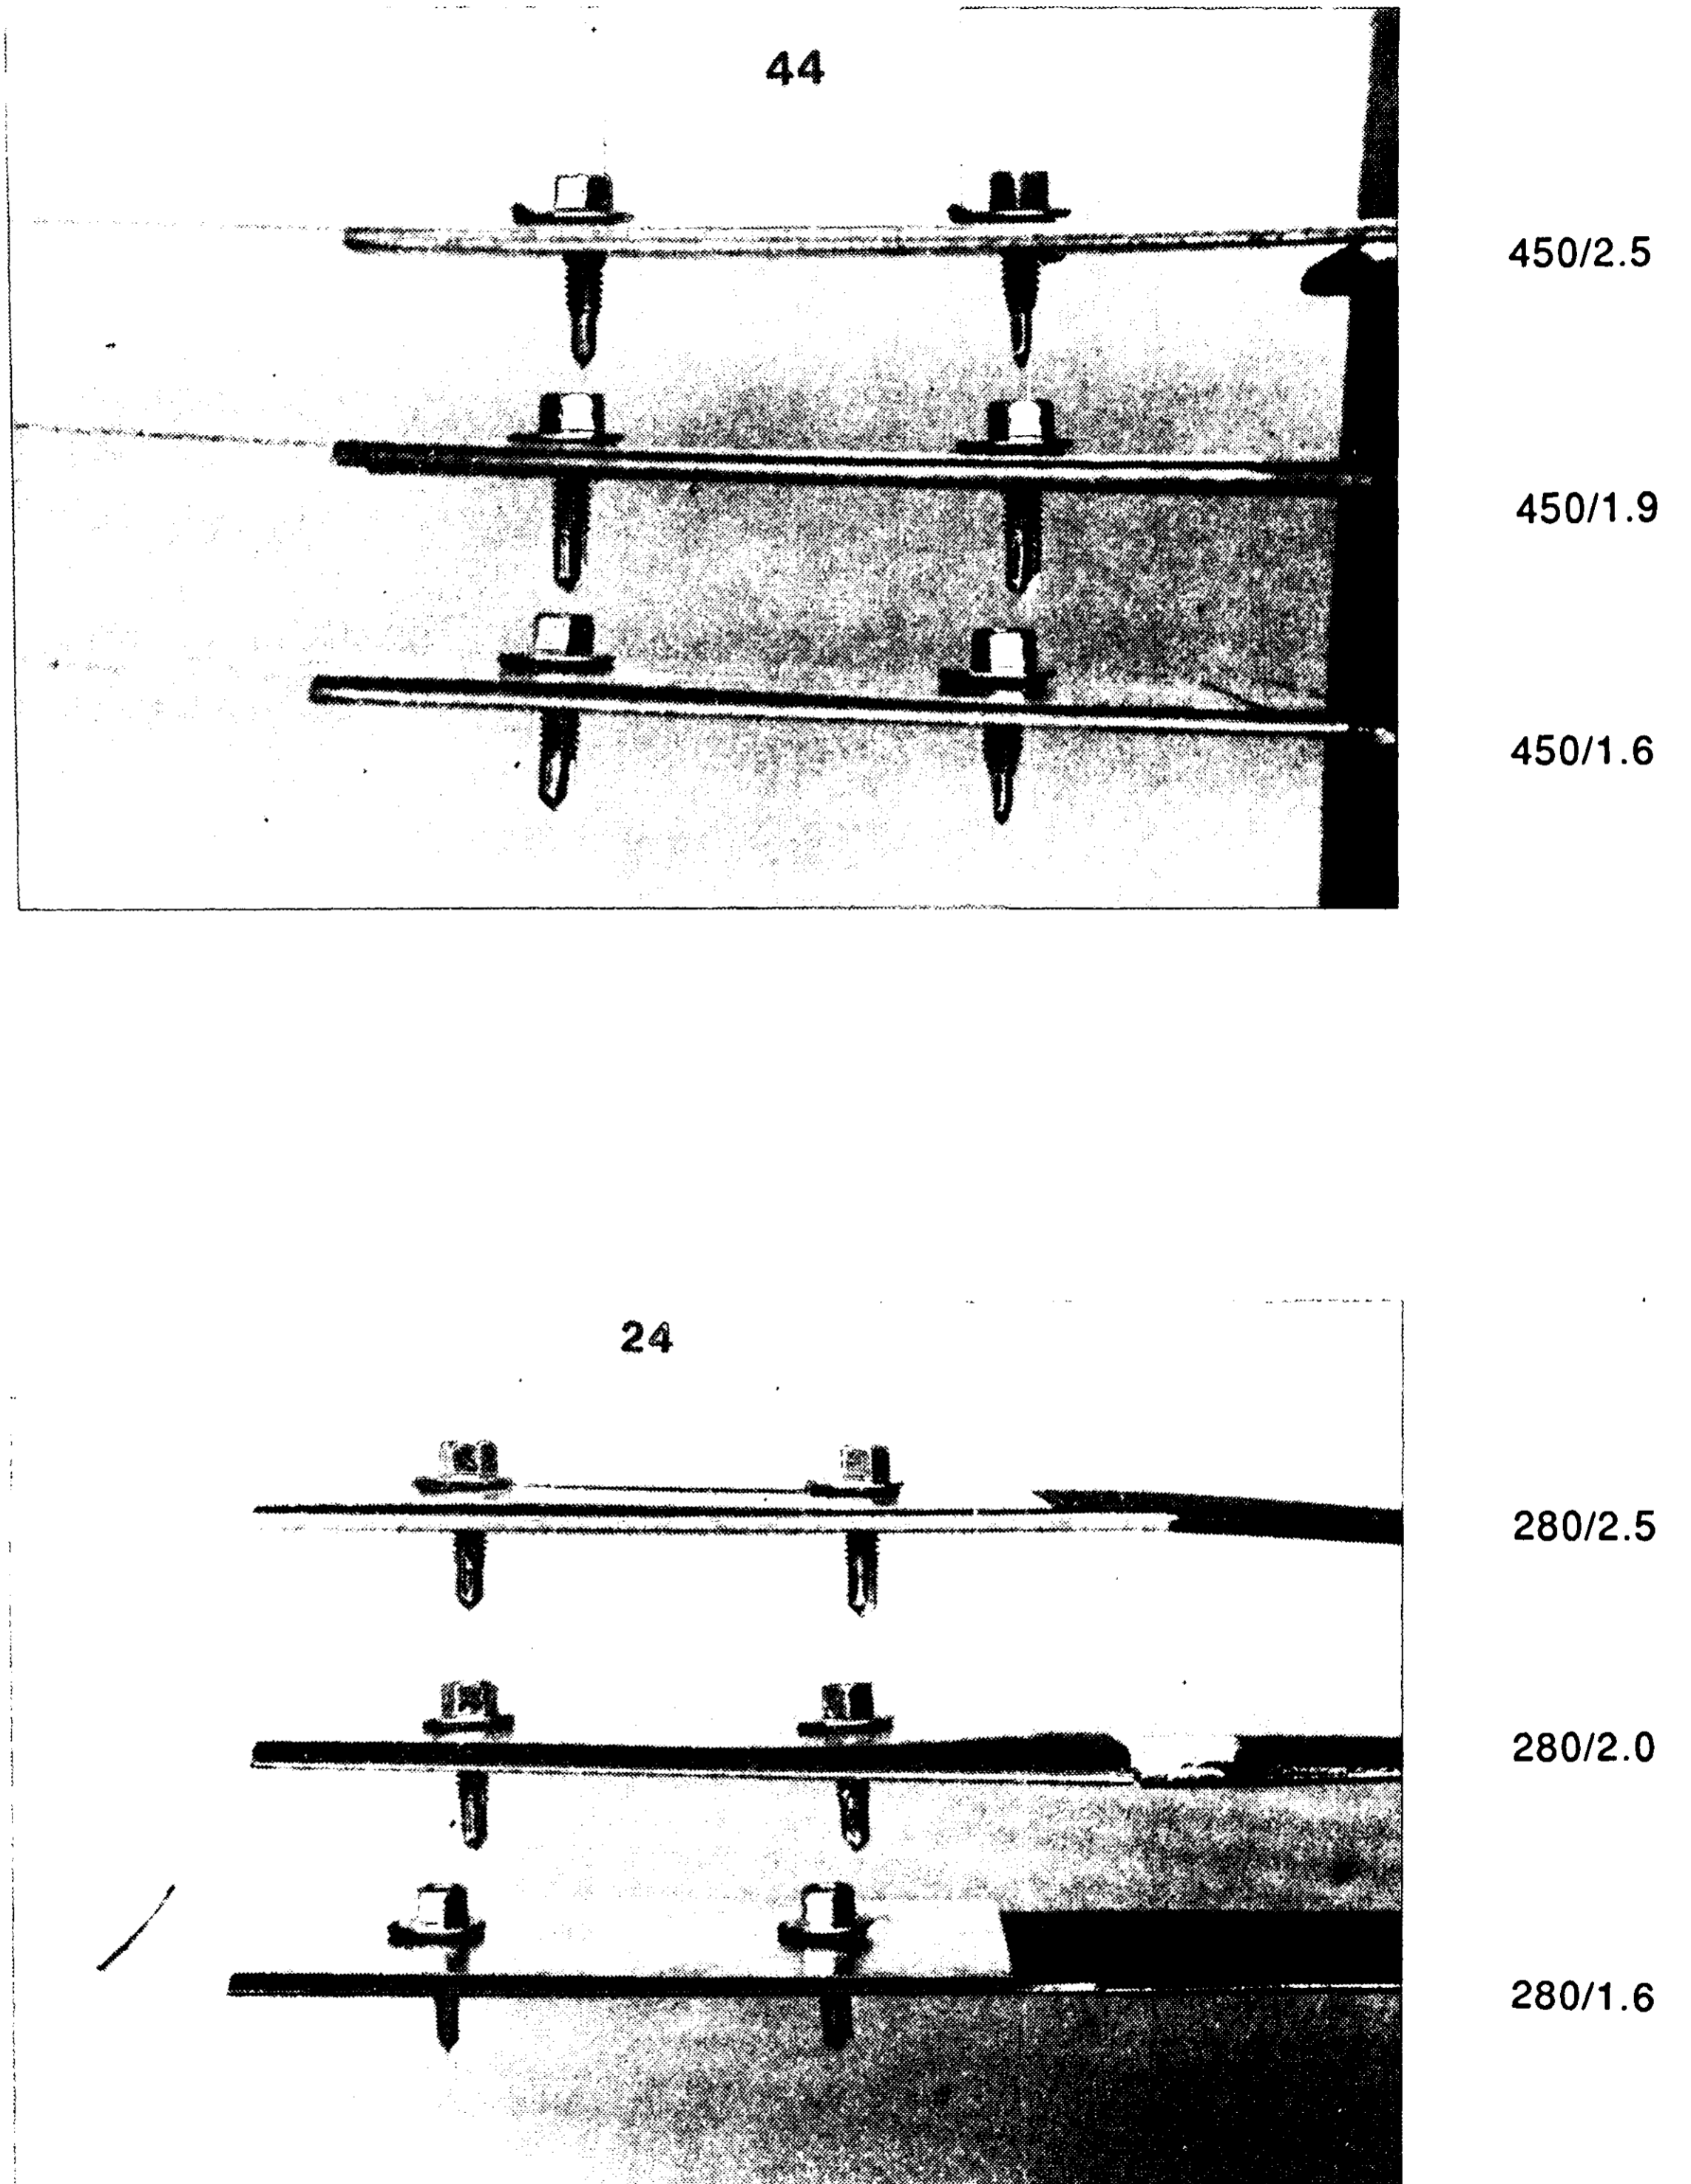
Sheet (0.40 mm)-to-purlin connections (12g neo) after shear tests.
